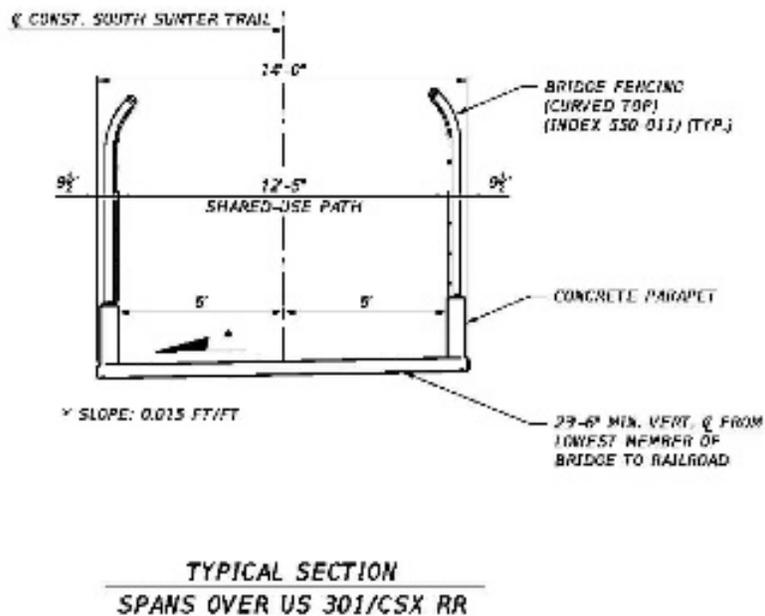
Typical Section – Span Over U.S. 301/CSX Railroad Crossing
